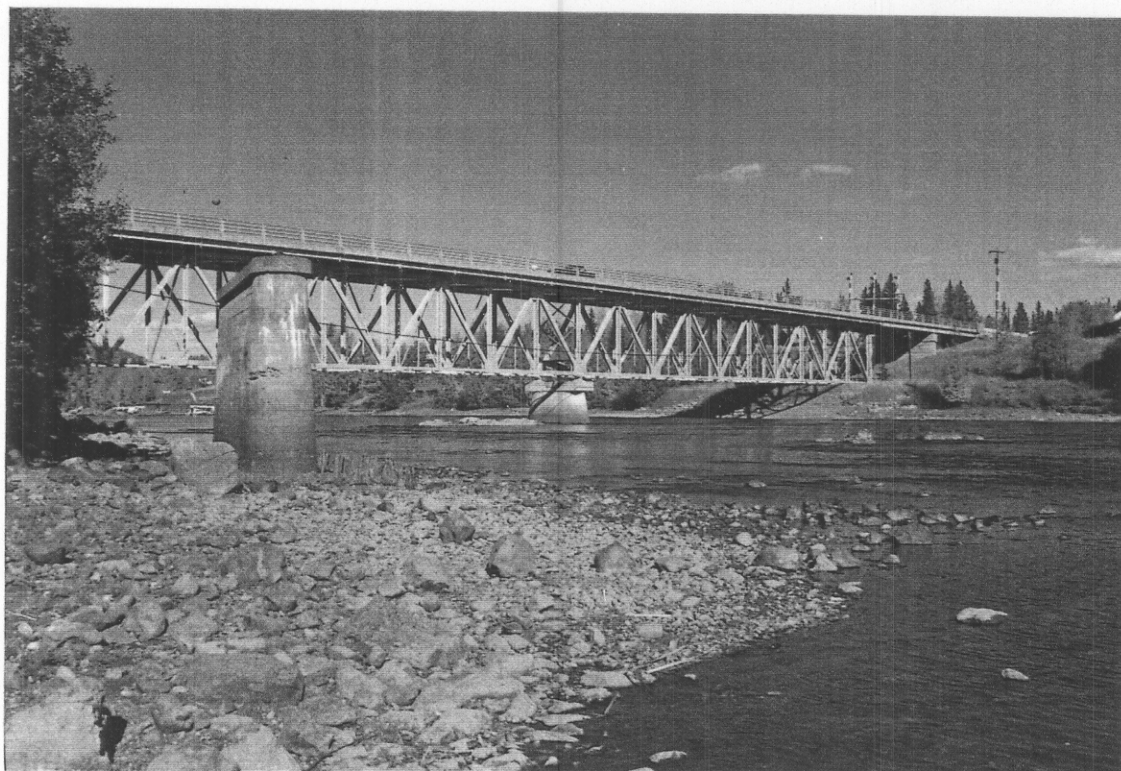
• STUART RIVER LOOKING UPSTREAM AT BRIDGE
